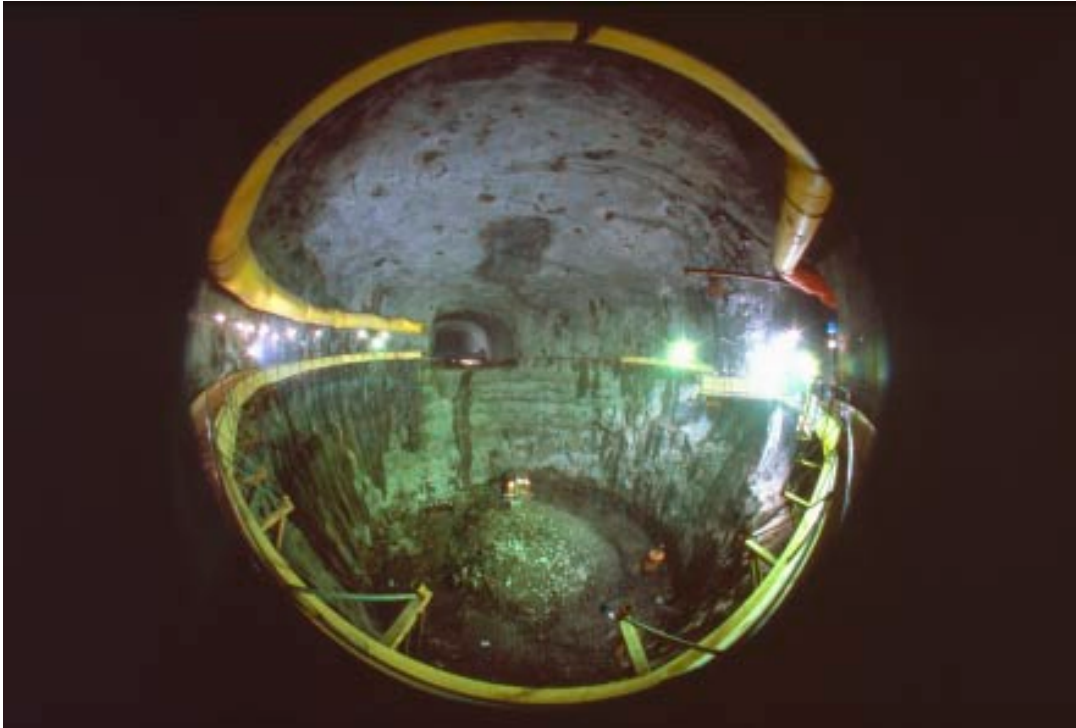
A fish-eye view photo showing excavation work in step (3), SFR. PhotoG Hansson/N.
